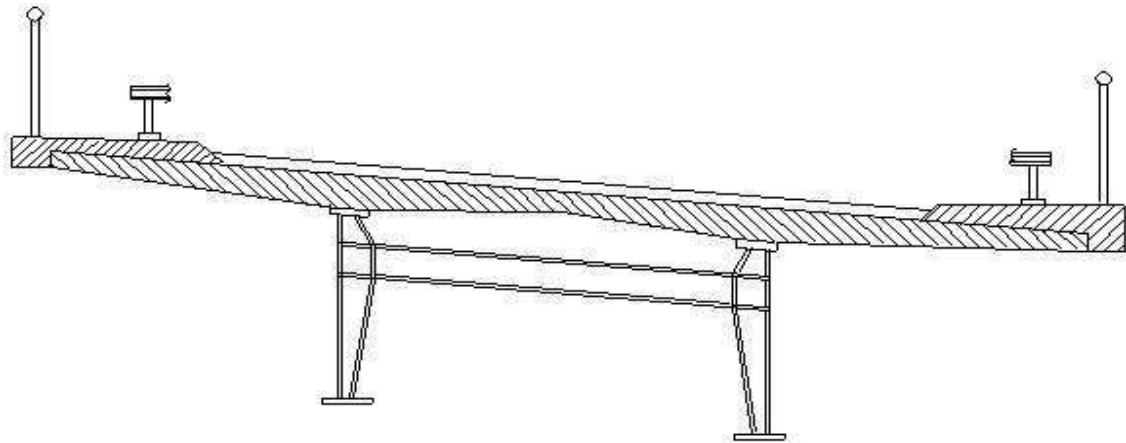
Typical Cross-Section of a Composite Plate Girder Bridge for Medium Spans
